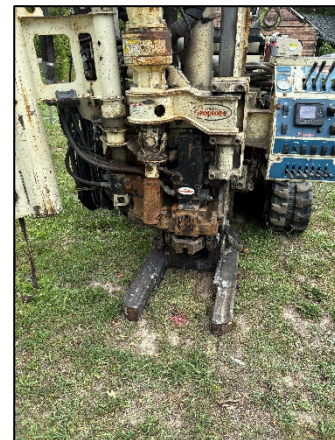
Viewing 14119 SB02 Drilling, Facing East.
